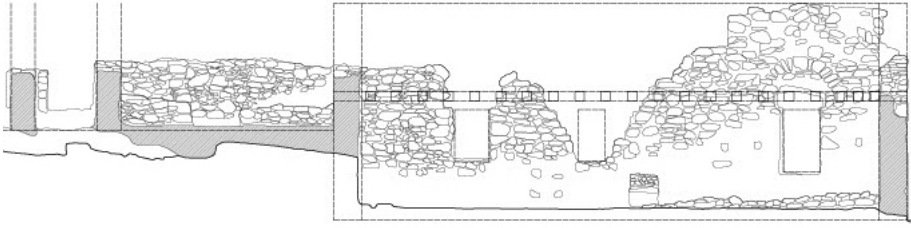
a. South elevation of the north wall of the Section A2.
